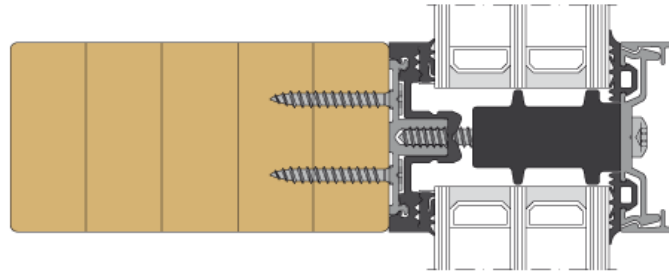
Curtain wall profile on a timber construction (Raico Bautechnik GmbH, n.d.).
